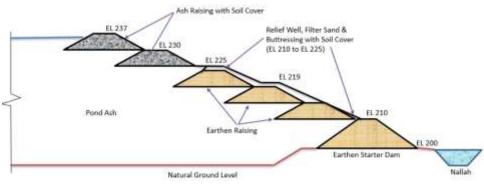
Schematic Diagram for Typical Cross Section of Dam (Not to Scale)
